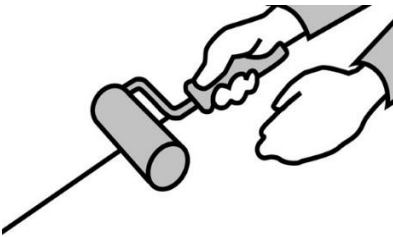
Cover the transition from the floor to the masonry with a strip no less than 300 mm wide.
